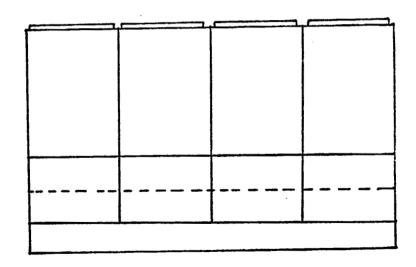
FBOS AND MBOS PLAN VIEW
